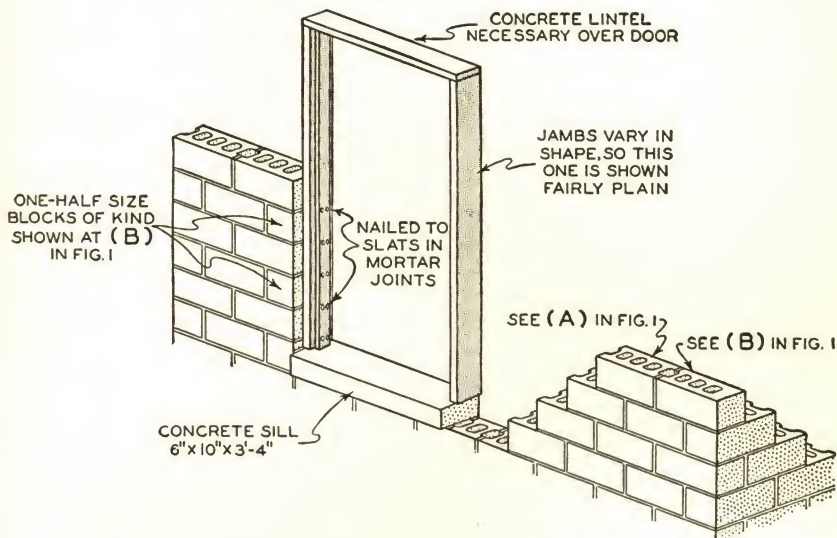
Part of One-Room Milkhouse Wall Showing Door Frame in Place
